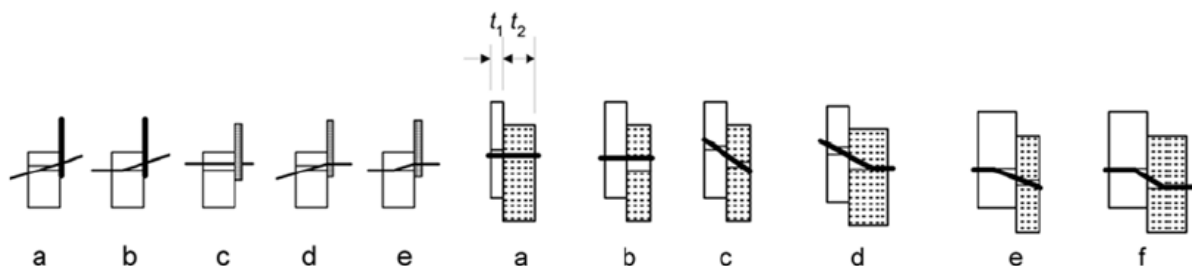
Failure modes for steel-timber (left) and timber-timber (right) connections according to EC5 [1.3].
